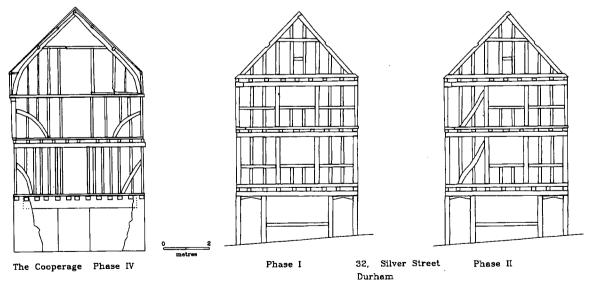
Front elevations; The Cooperage and 32, Silver Street, Durham.
